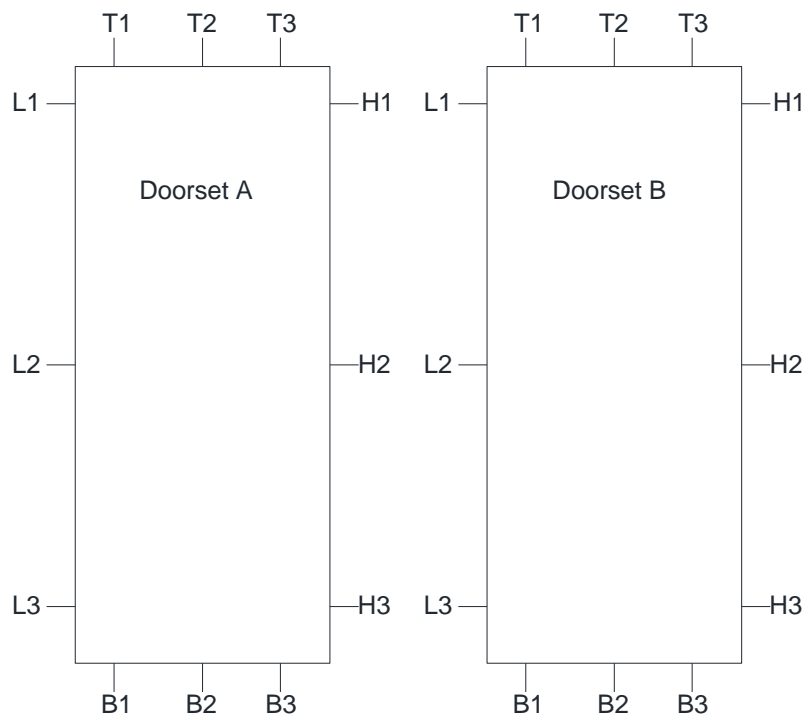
Clearance measurements, Doorset A and B (unexposed side shown)
